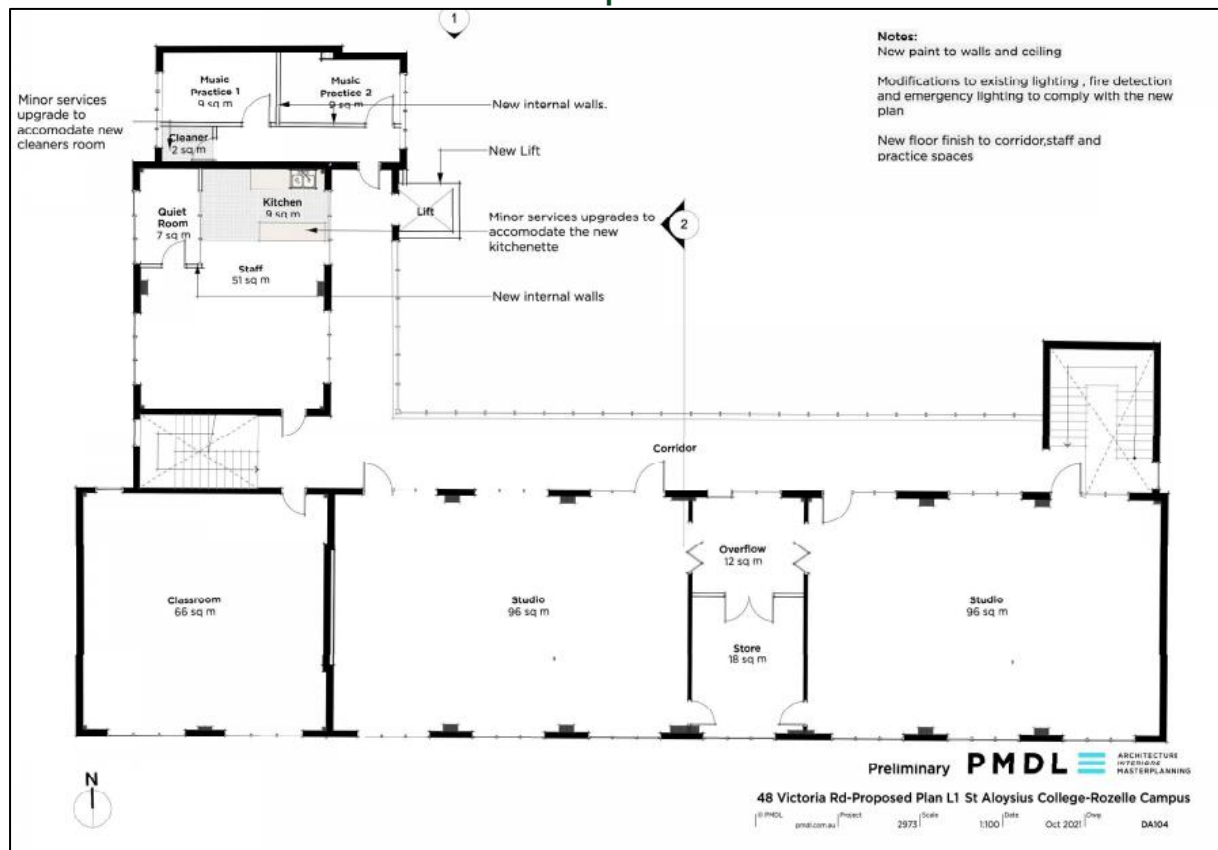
48 Victoria Rd – L1 Floor Plans (PMDL, 2021)
